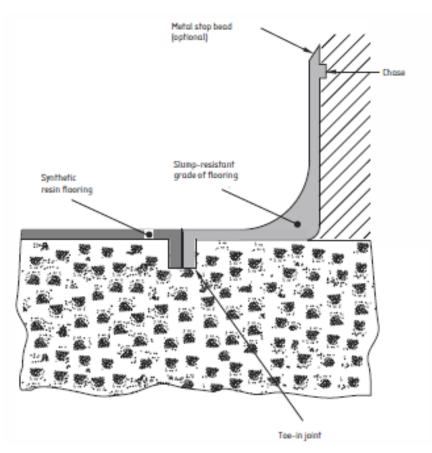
Floor to Wall Joint, Coving (BS 8204.6)
